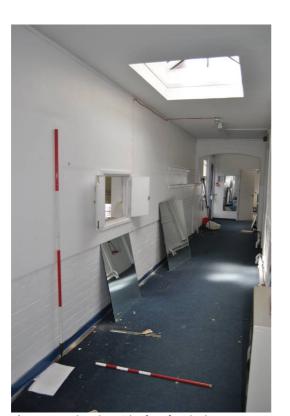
Enclosed corridor [F.1a] with observation window onto assembly hall.
